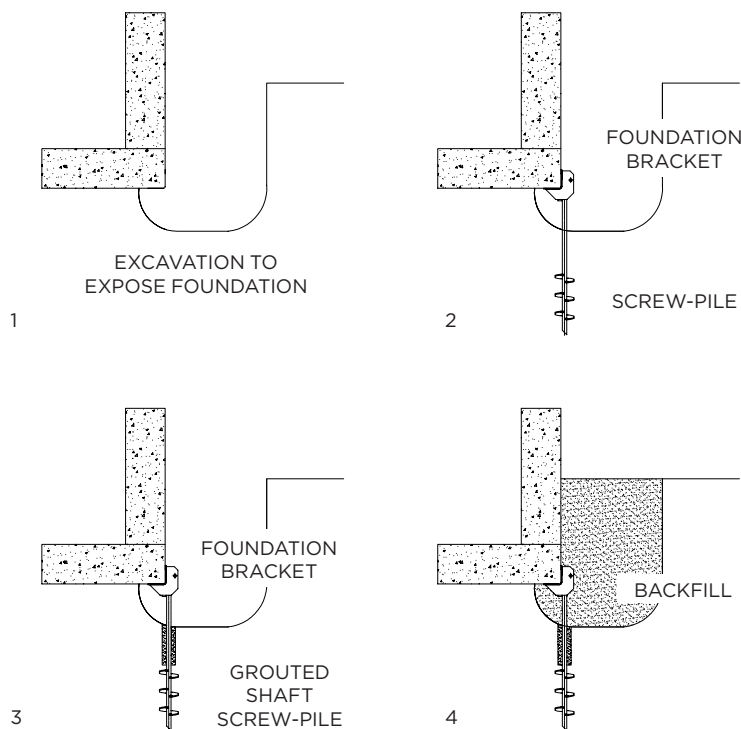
SEQUENCE OF UNDERPINNING EXISTING FOUNDATIONS WITH SCREW-PILES.
